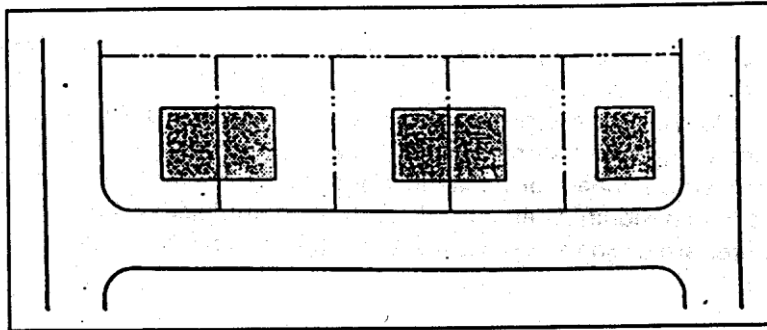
F – ZERO LOT LINE/COMMON WALL DEVELOPMENT
